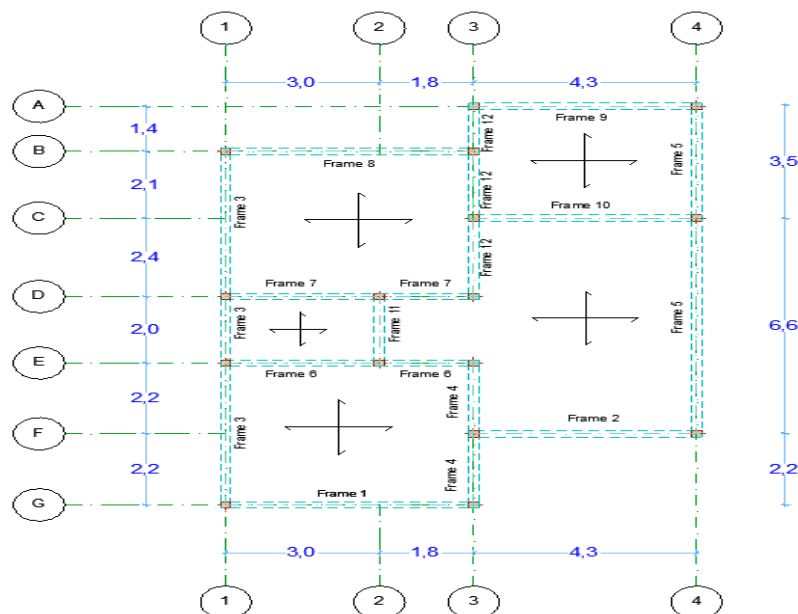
The Plan Consists of a Solid Slab, Beams (Frames), and Columns
